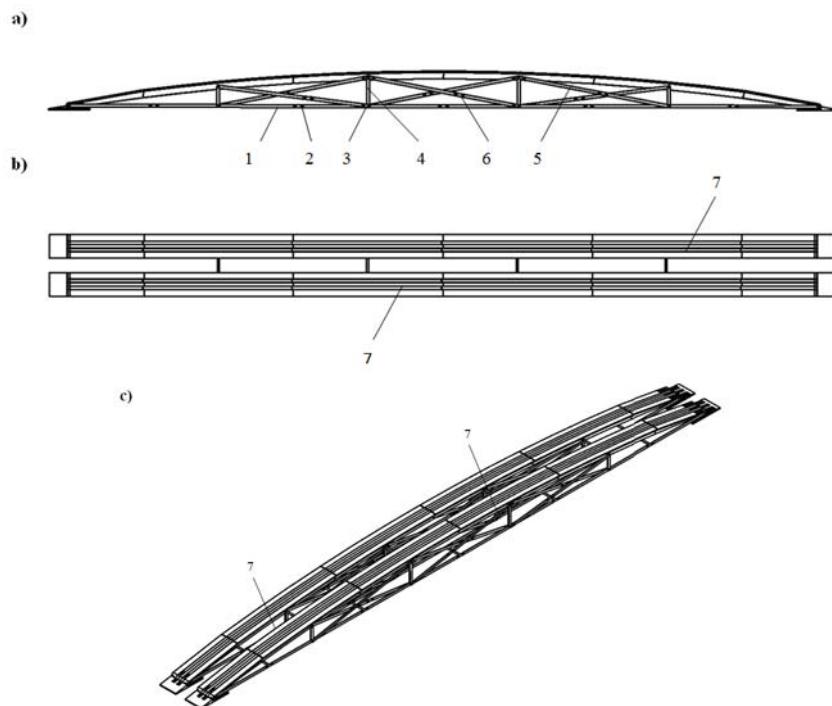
a -The bridge side view; b - The bridge top view; c - The deployed bridge construction
